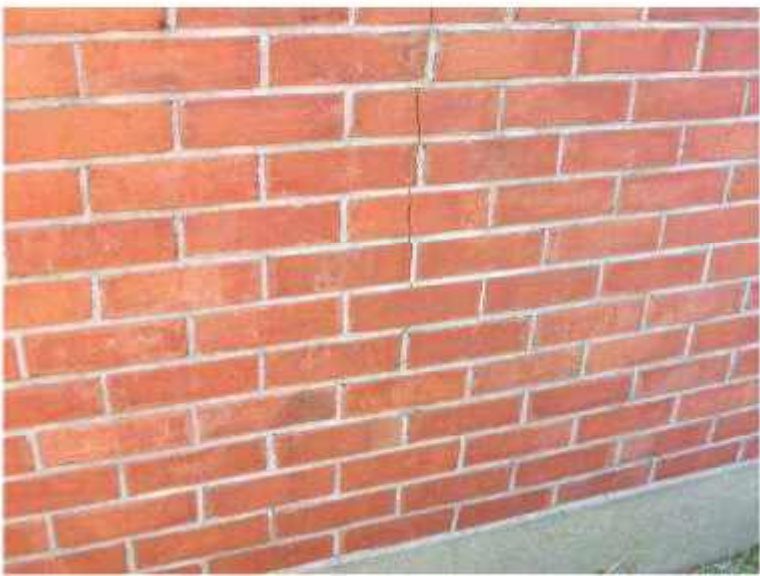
Moderate Vertical Cracking through Brick Veneer at Right Wall of Flat 7 (Photo 1 of 5) Looking Southeast
